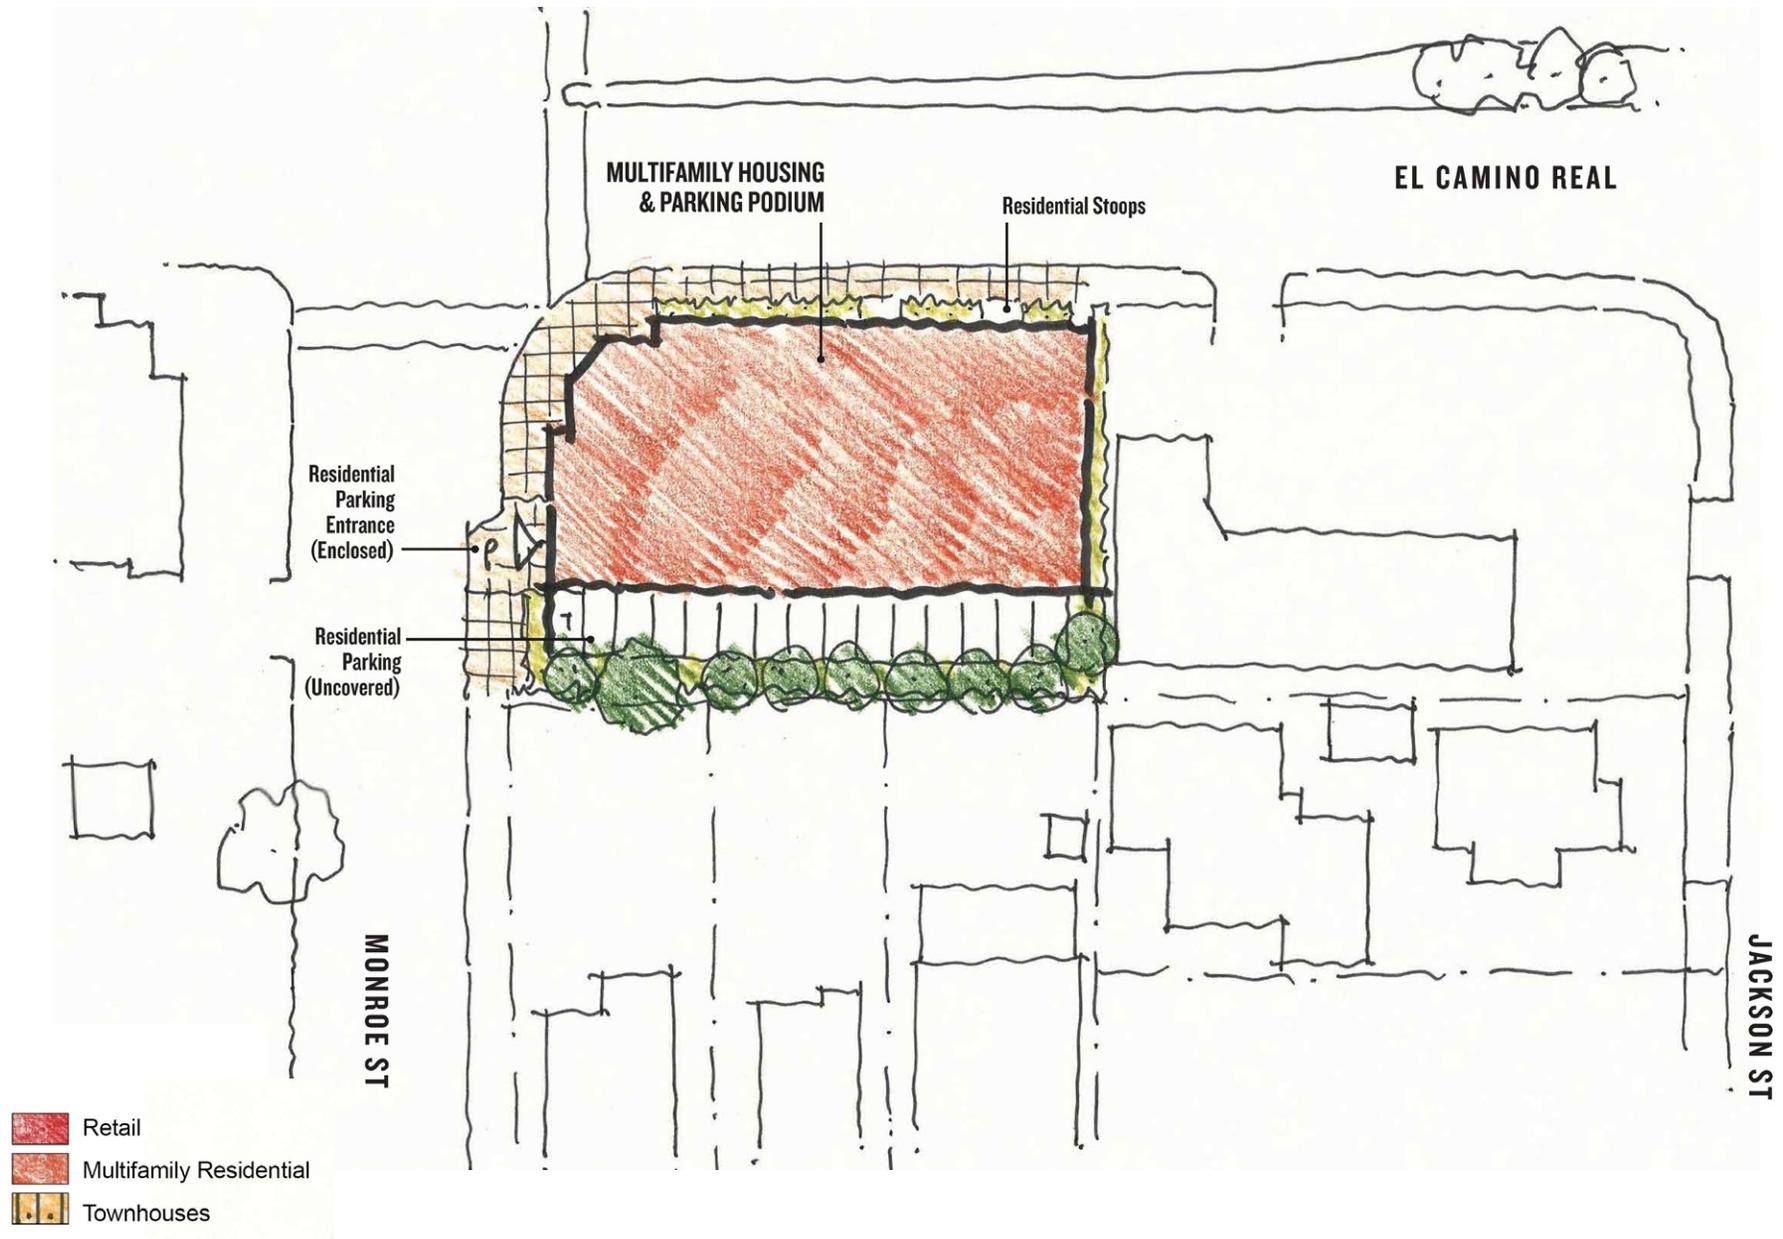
Corridor Residential Conceptual Site Plan 2
